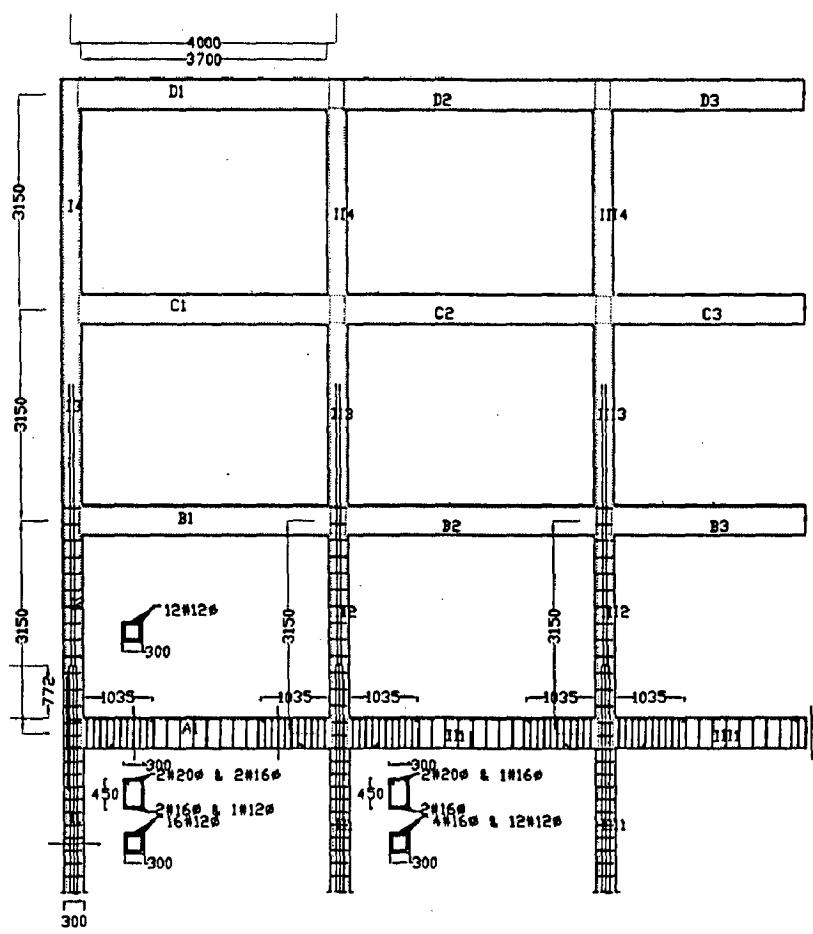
Details of beam and column reinforcement of exterior frame for Zone II
